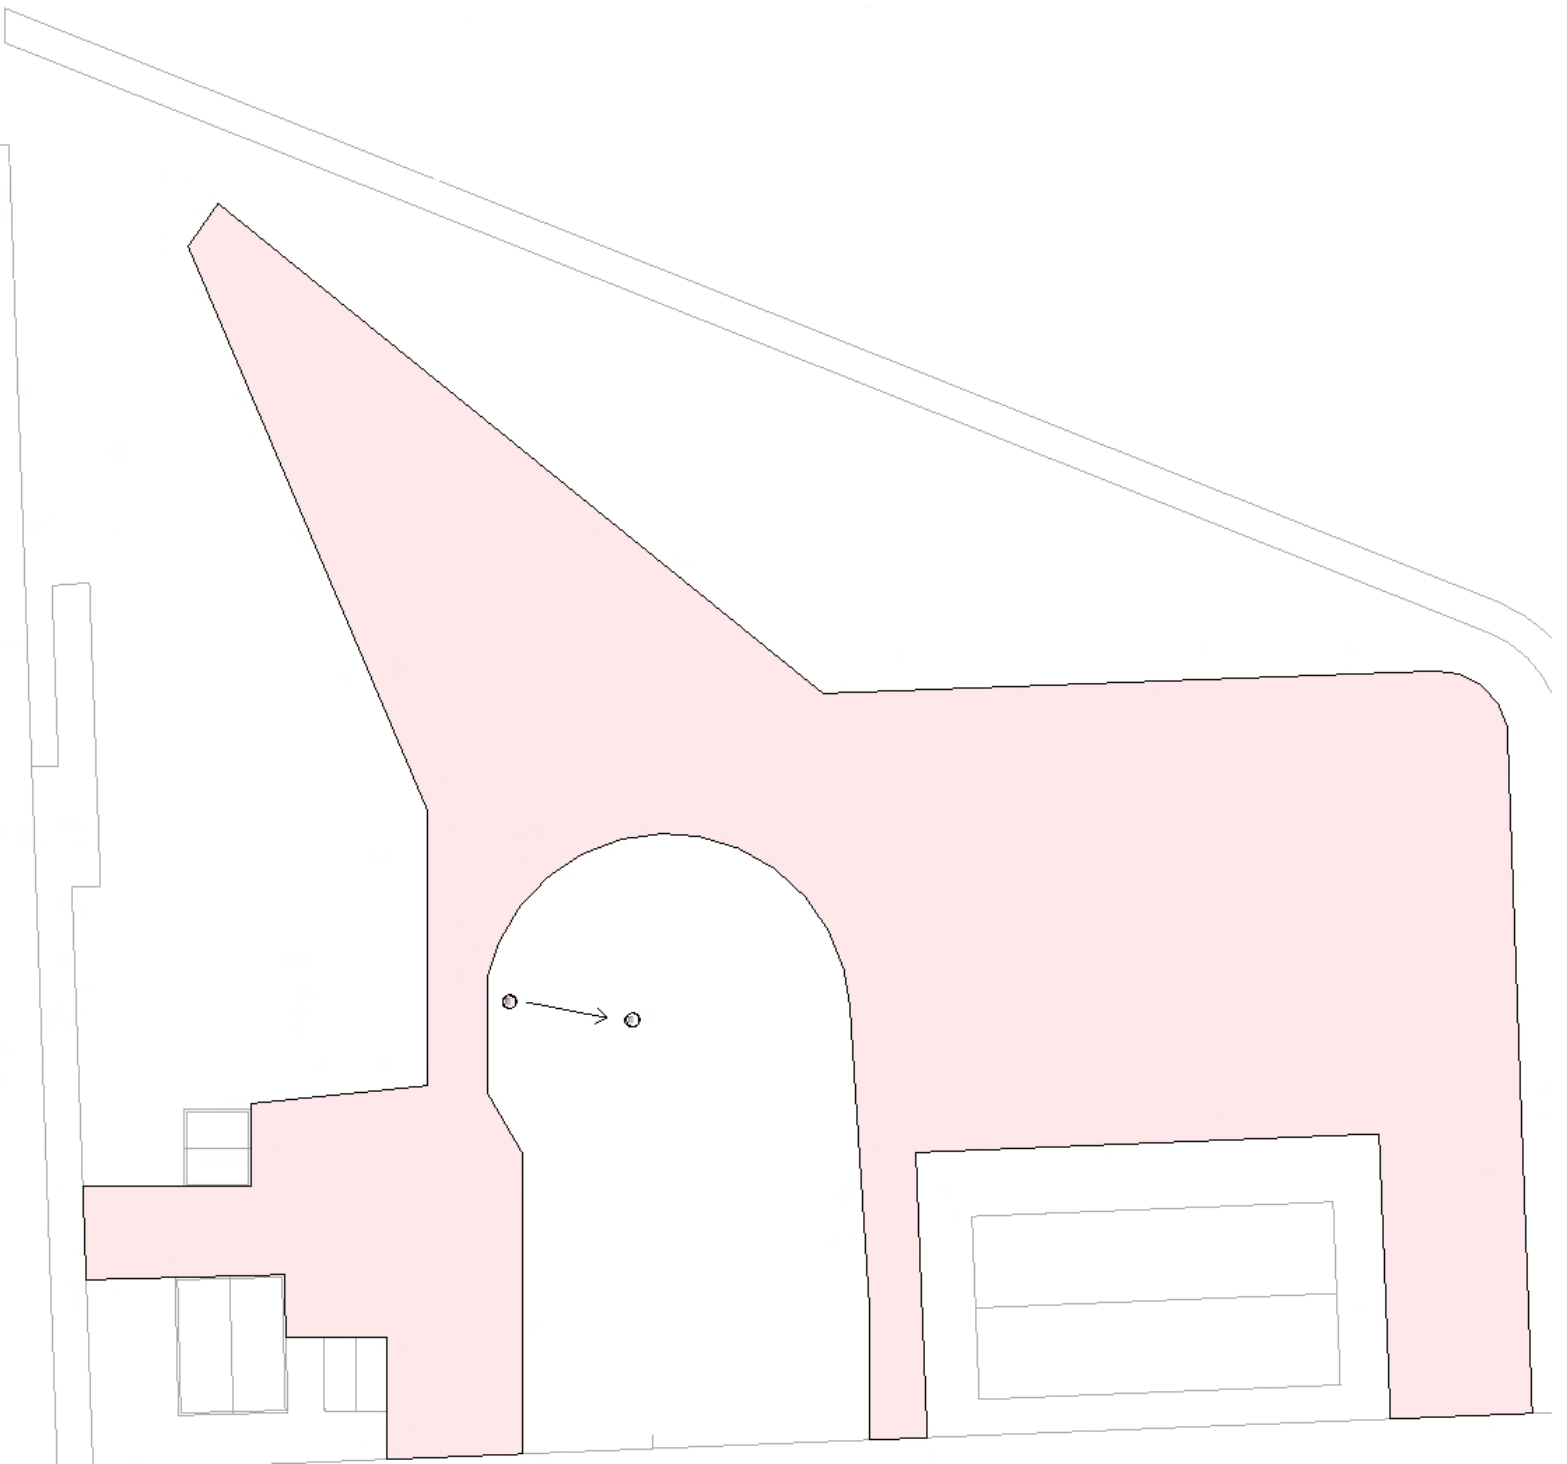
Site preparation including roughly 900 cf of gravel excavation shown in the red area with exact extents to be determined on site. The existing power pole should be relocated such that it does not cause conflict in the future.
